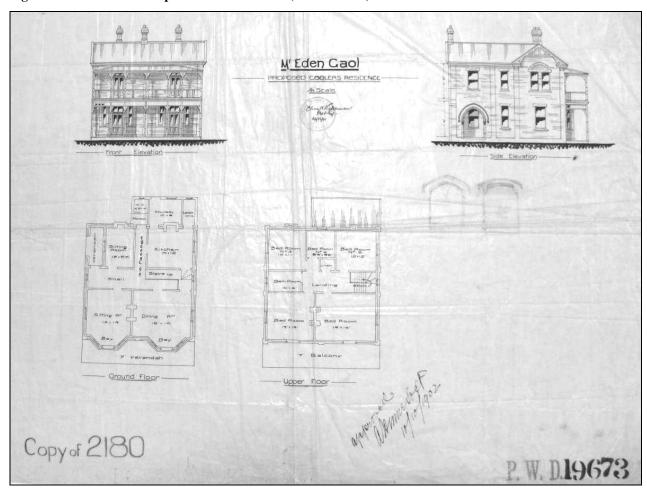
Plan of 'Gaolers House' dated 1901/2 (Archives NZ, Wellington)
